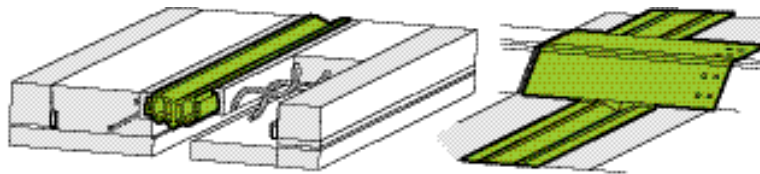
Detail of the footpath joint. Right: kerb cover plate.
